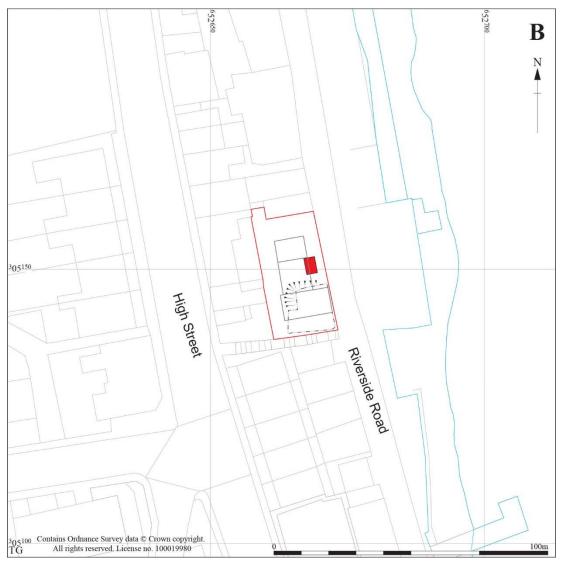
Site detail showing proposed footings (grey) and trial trench location (red)
